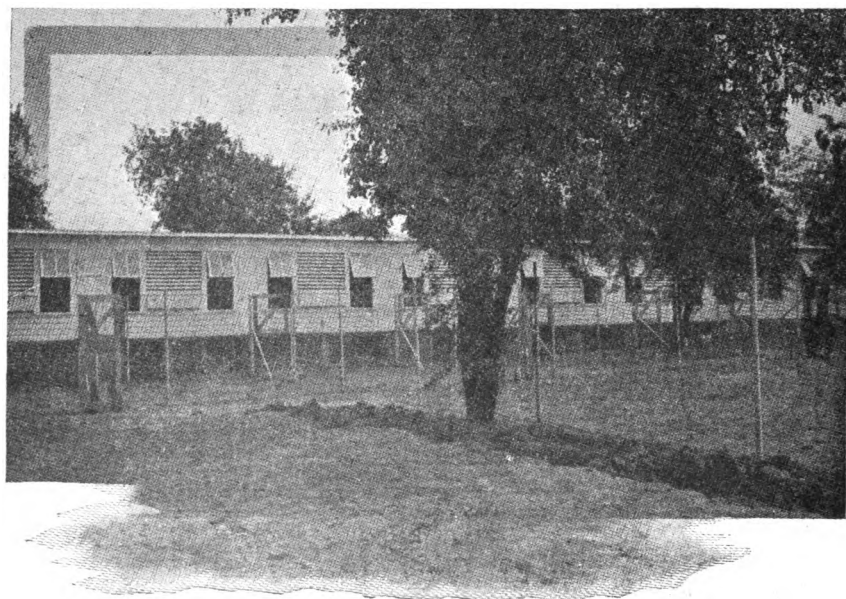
Quisenberry 180-ft. fool-proof laying and breeding concrete house. Also shows the forms in front which are supporting the elevated walk. These forms will be removed and yards made in front so that the hens can pass underneath the walk into the yards.
